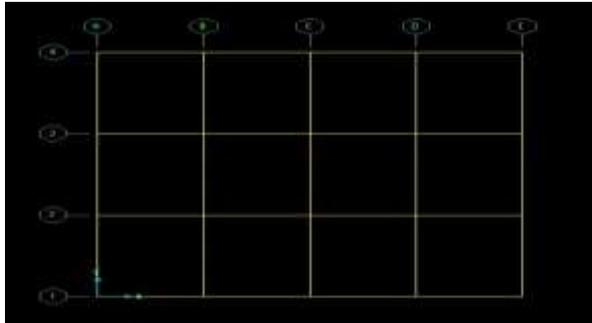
Plan of G+10 storey R C building in SAP 2000
